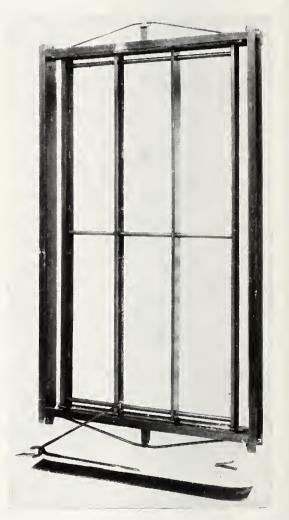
Test frame with the frame of a wall specimen in place.
